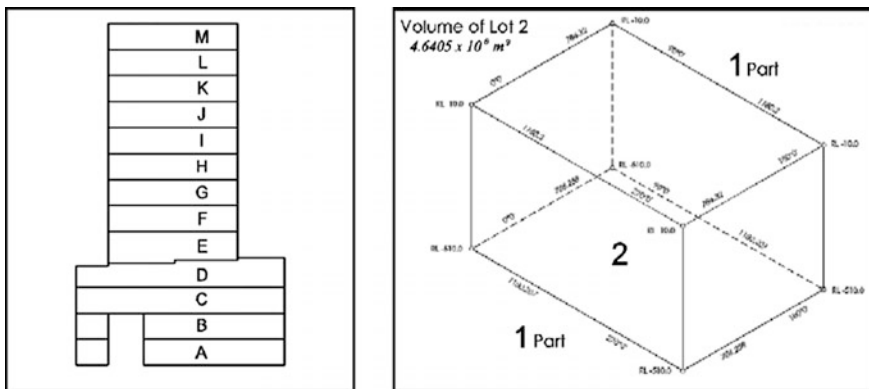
Building format plan (Left) and volumetric format plan (Right) (DERM 2011)
